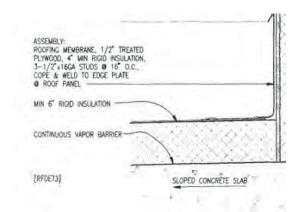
Excerpt from Project Record Drawings indicates that the low-slope roof assembly consists of a sloped concrete deck, a vapor barrier, 6-inches of rigid insulation, and the mechanically attached roof membrane. However, BET&R discovered that the vapor barrier did not appear to exist and that the insulation was actually 4-inches thick rather than 6-inches thick.
